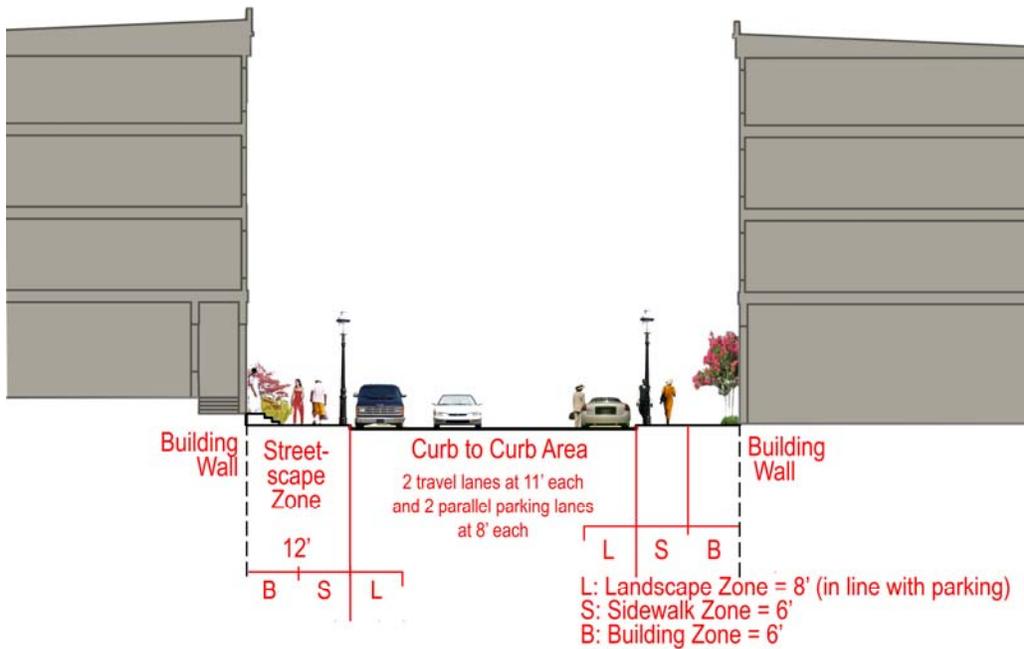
LOCAL STREET STREETScape SECTION (LOCAL STREET TYPE 2)
